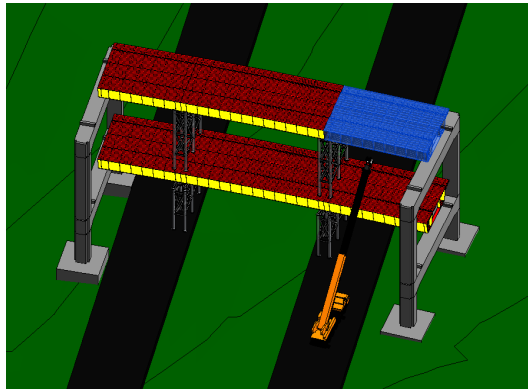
BIM model for hoisting of section III in upper right steel box girder
